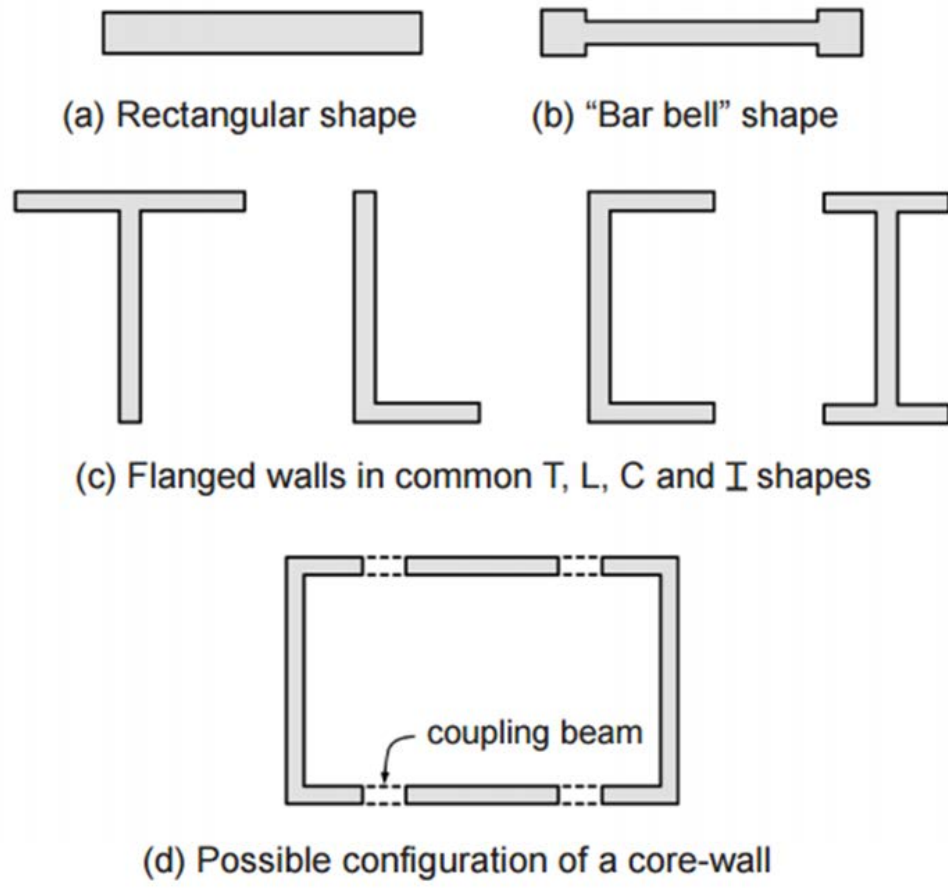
Various wall cross sections (National Institute of Standard and Technology (2012))
